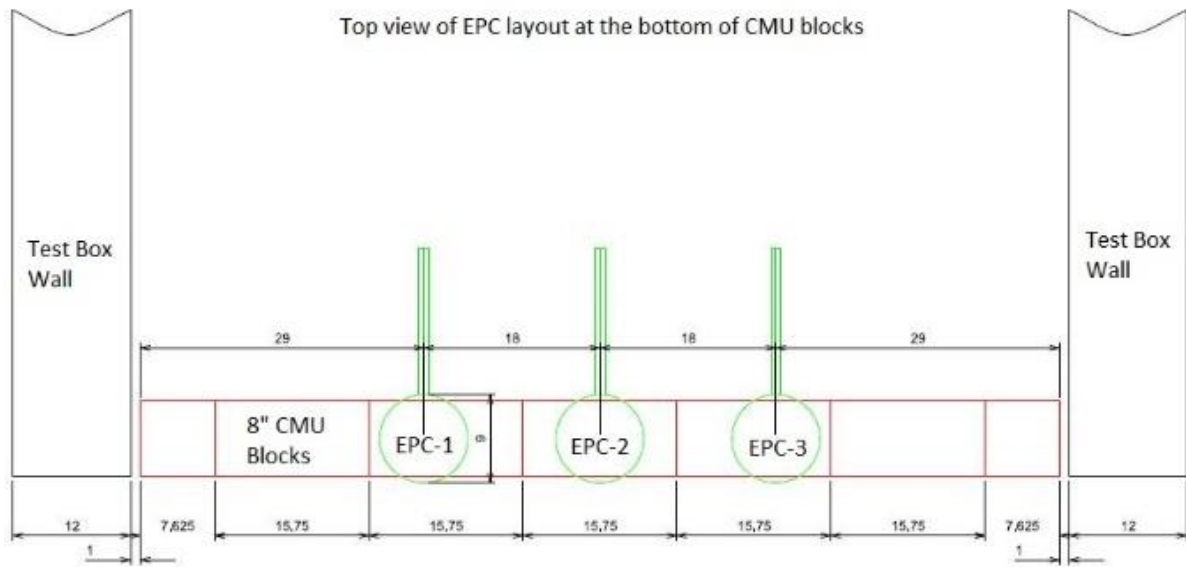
EPC layout under the facing of GRS Abutment Model #1 (plan view; dimensions are in inches)
